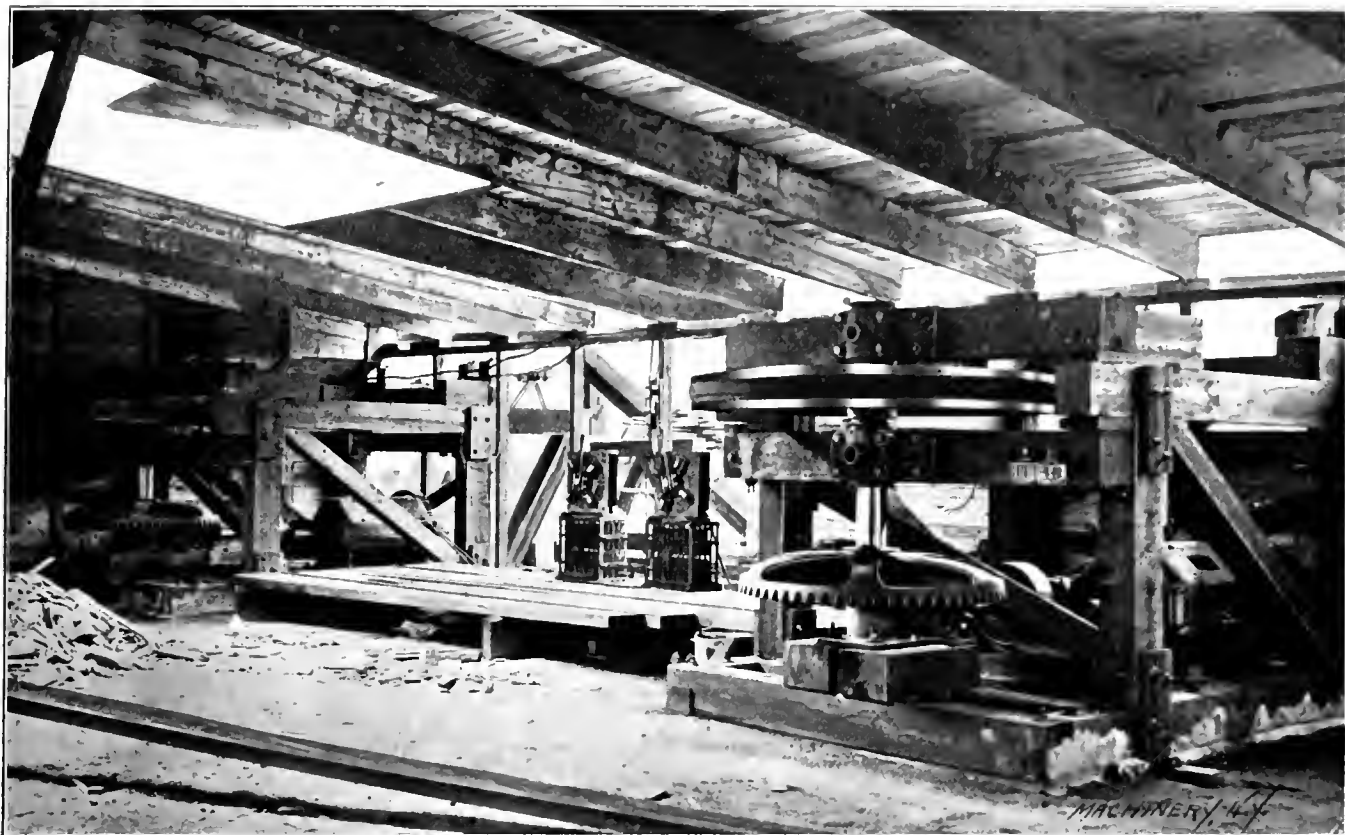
Cable Hauling Machinery, Brooklyn Anchorage Manhattan Bridge.
